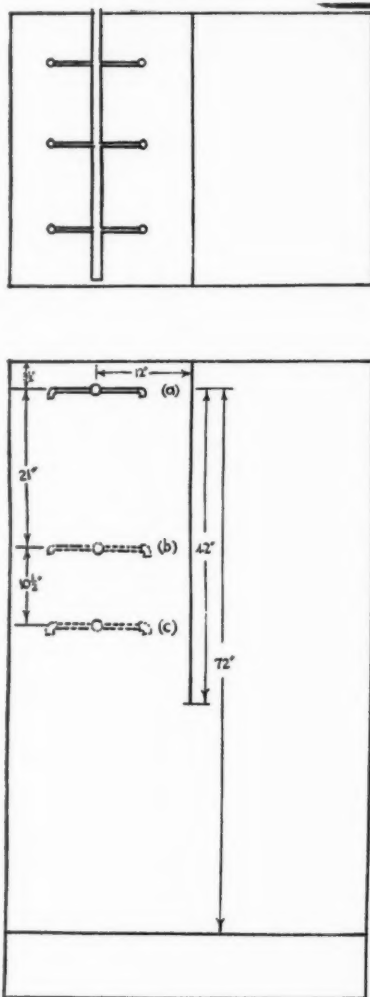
ELEVATION SECTION OF SPRAY CHAMBER SHOWING ELEVATIONS OF SPRAY NOZZLES ABOVE TOWER OUTLET
